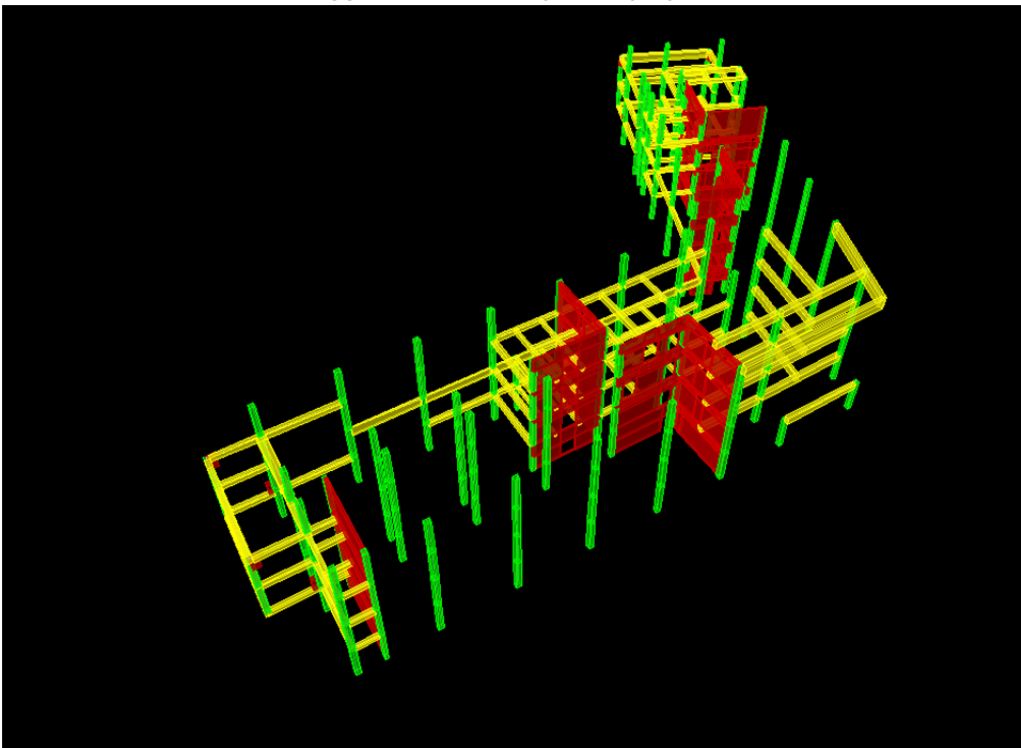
ETABS MODEL SHOWING SHEAR WALLS, BEAMS AND COLUMNS
